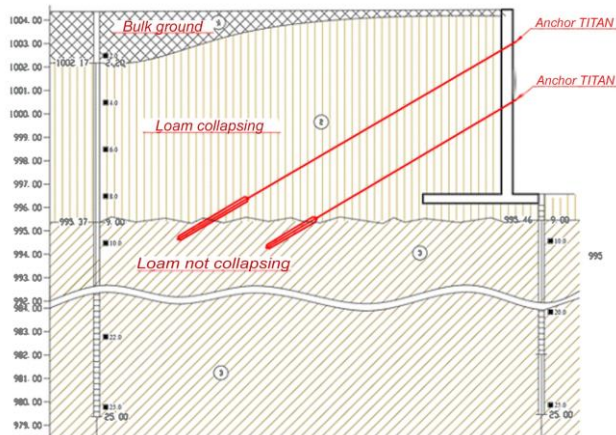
The reinforcement scheme of the retaining wall in Remizovka.
